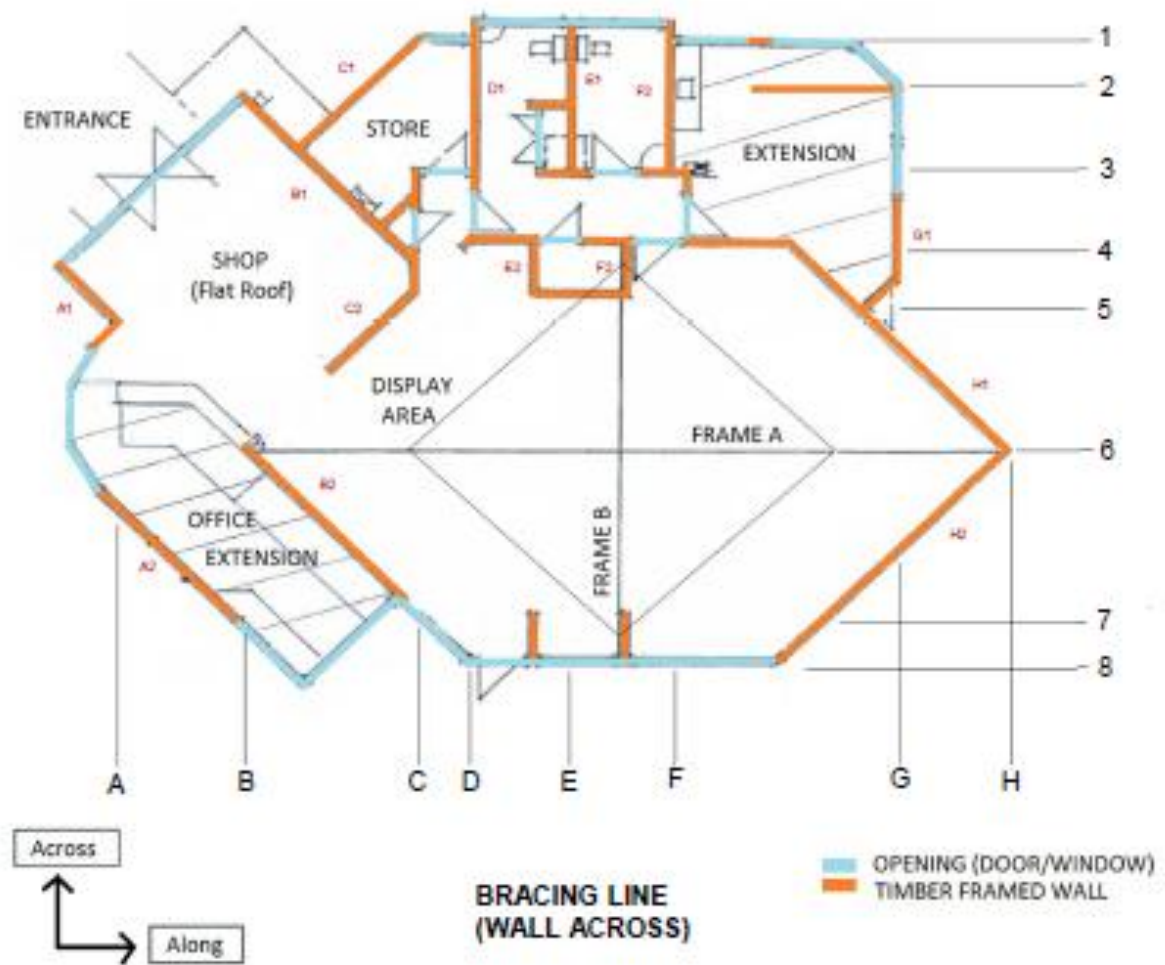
Plan Sketches Showing Numbering Sequence for Bracing Elements (Across)
